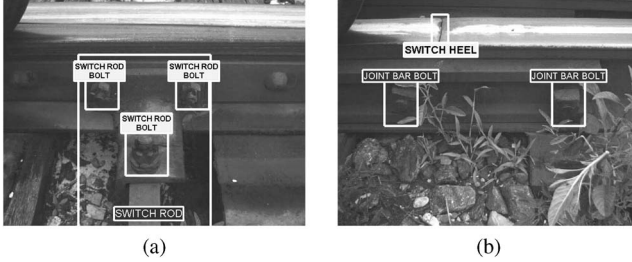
Turnout components. (a) Switch rod and its bolts. (b) Switch heel and joint bar bolts.
